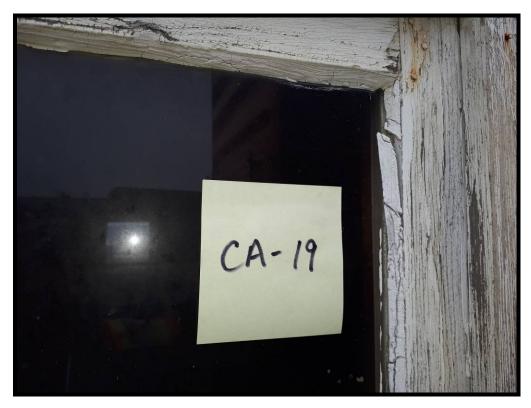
Sample # CA – 19 : Asbestos-containing window glazing (white) located on the Rip Track Fuel Shed.(0.5% chrysotile asbestos)
